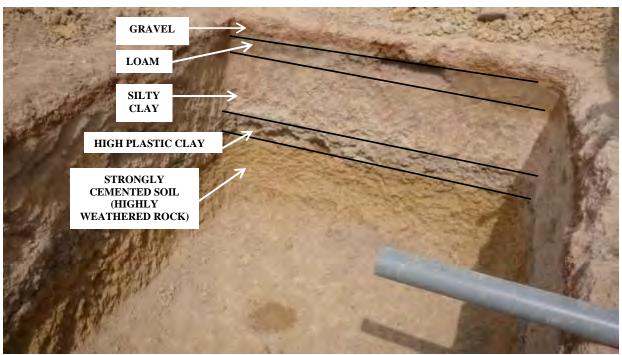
SOIL PROFILE AT THE SEPTIC TANK EXCAVATION ADJACENT TO THE PHW FACTORY
